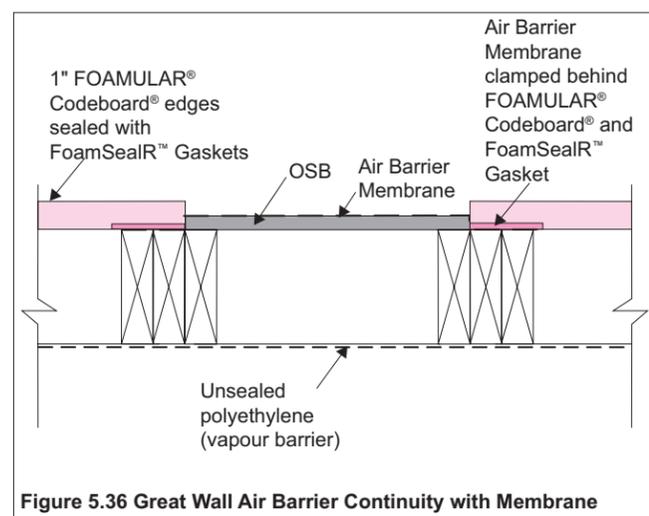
Great Wall Air Barrier Continuity with Membrane
